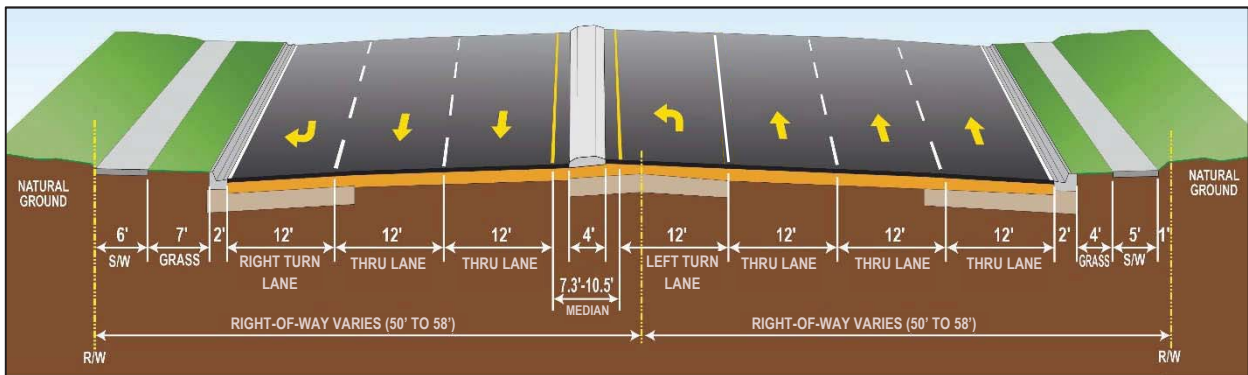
Typical Section with 100 to 116' r/w - SR 50 from South Lake Plaza (650' West of Bloxam Avenue) to Bloxam Avenue
